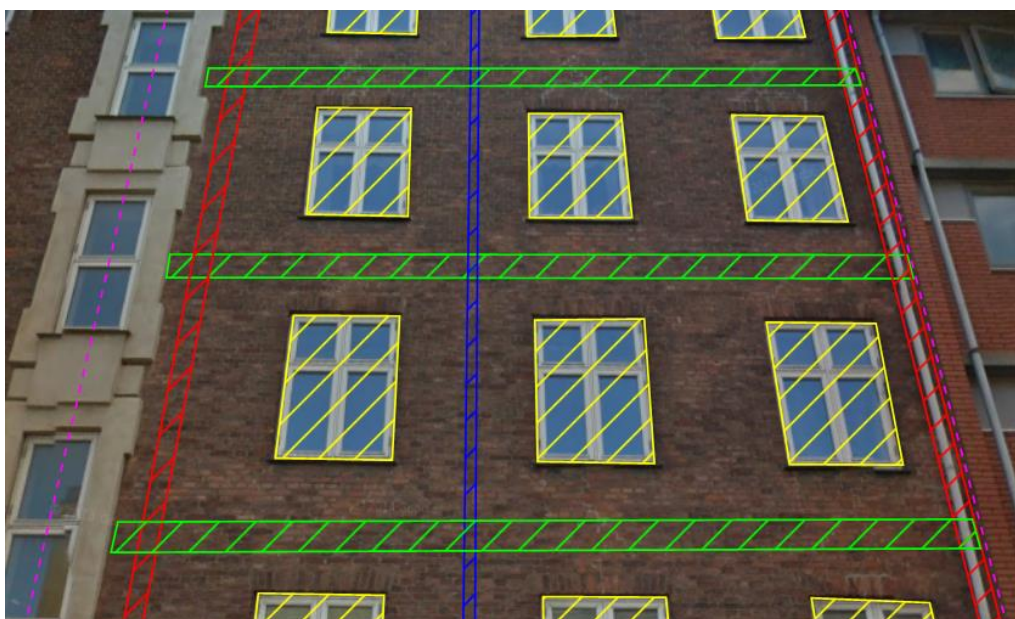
Exterior surface of a 1927 multi-storey building with a window/thermal envelope ratio of 43.0 % within the pink dashed lines. Hatches were defined as follows: Yellow = windows, blue = light interior walls, red = solid/fire walls, green = floor structure. Hatches were based on actual floorplan (Original photo by Google street view).
